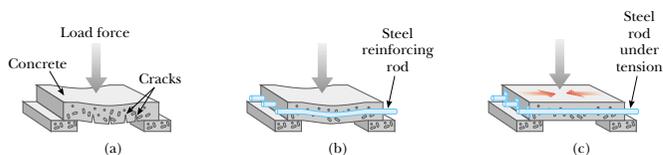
(a) A concrete slab with no reinforcement tends to crack under a heavy load. (b) The strength of the concrete is increased by using steel reinforcement rods. (c) The concrete is further strengthened by prestressing it with steel rods under tension.
